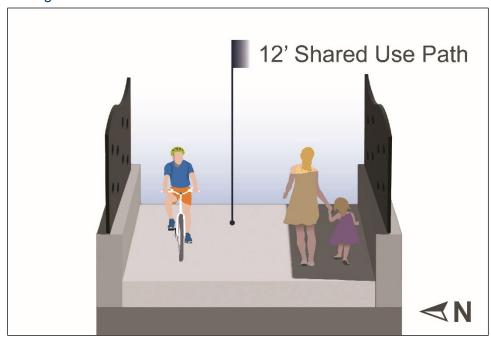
Action Alternative: 800 West Woods Cross
